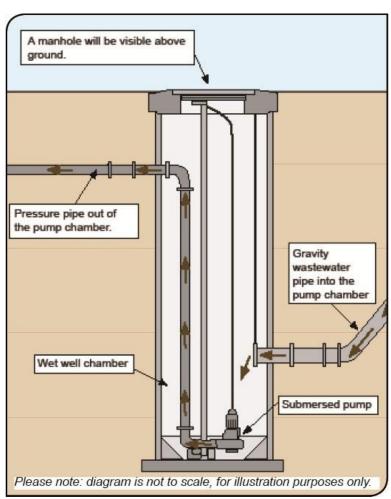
Diagram of an Underground Wastewater Lift Station (SCIRT Rebuilding Infrastructure, 2013)
